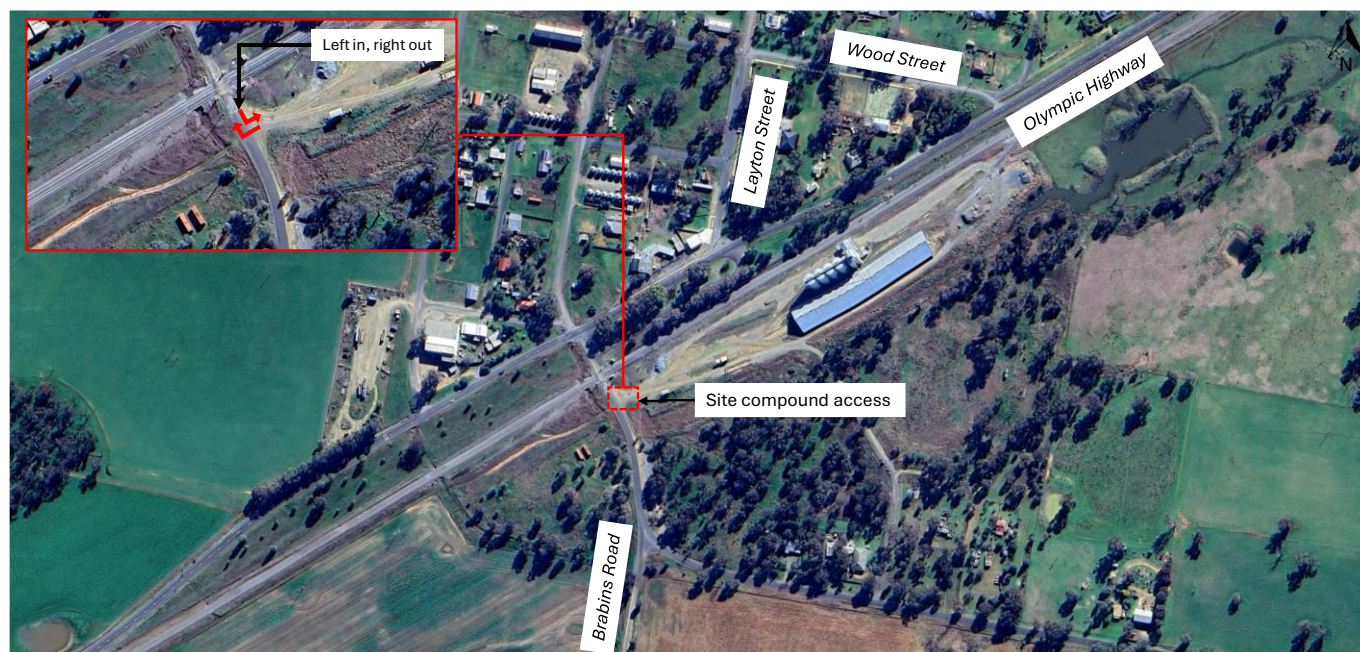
SITE ACCESS DETAILS – SITE COMPOUND ACCESS
